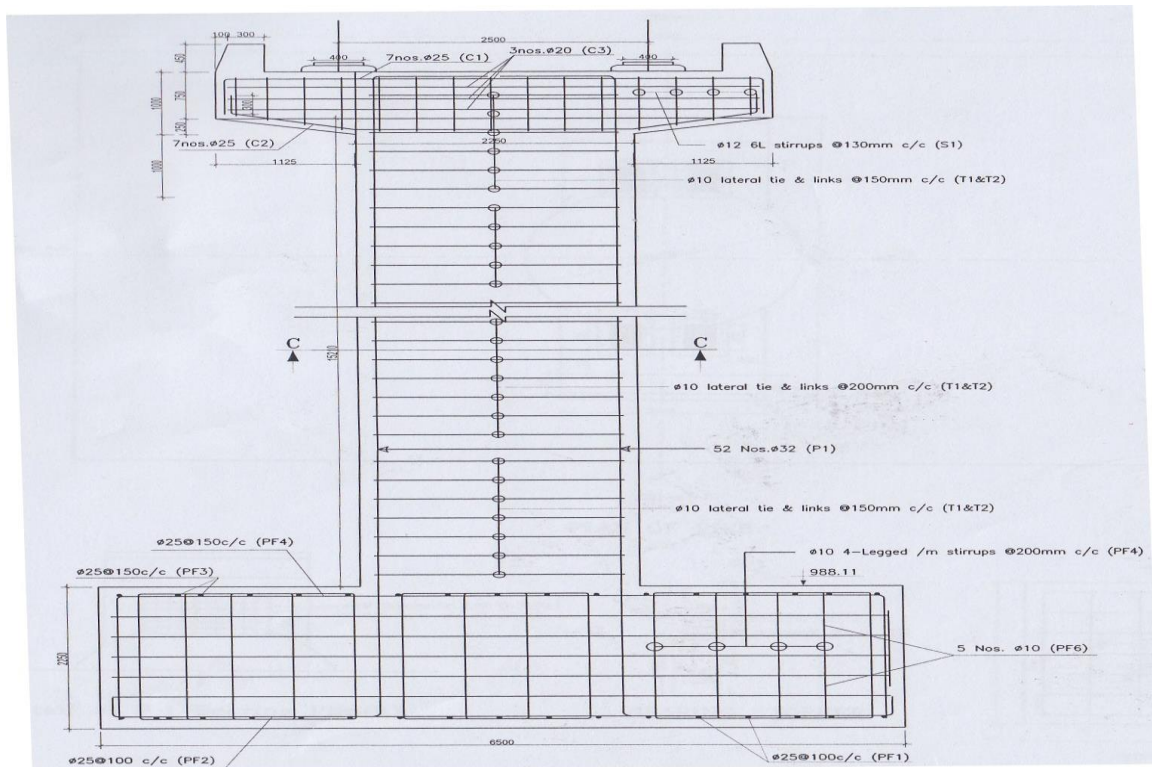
Reinforcement details in Bridge pier After 2000 Open
